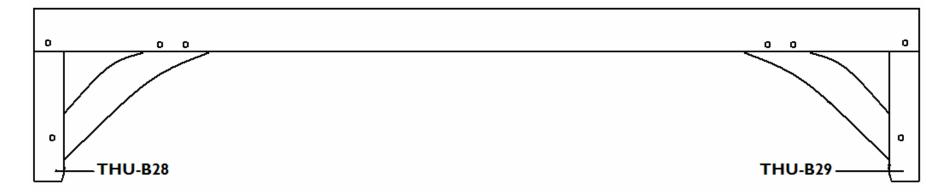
Upper in-situ timbers; sketch of south truss, showing the location of samples THU-B28 and THU-B29
